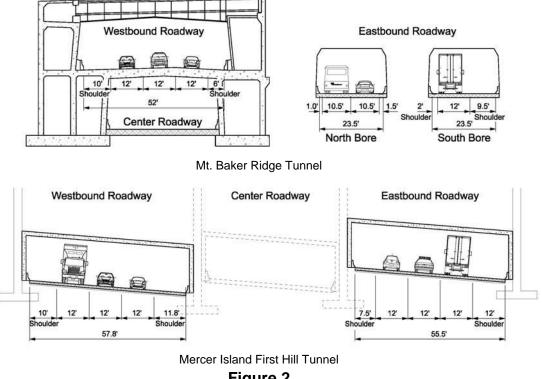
Existing I-90 Tunnel 3-Lane Cross-Sections (Typical)
